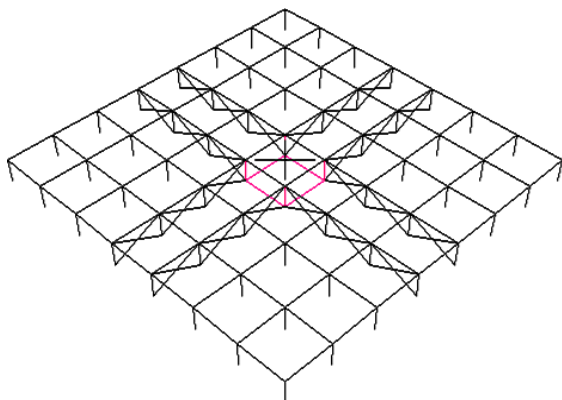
Perspective view of the model with central core and extended outrigger on all thefour sideswithout belt truss.
